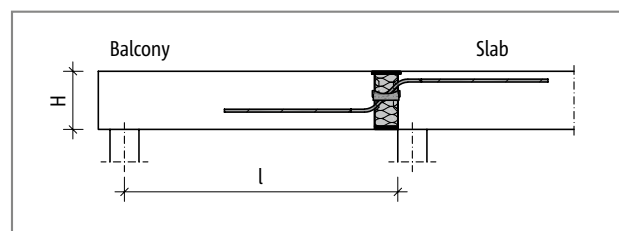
Schöck Isokorb® T type Q-E-V: Static system
